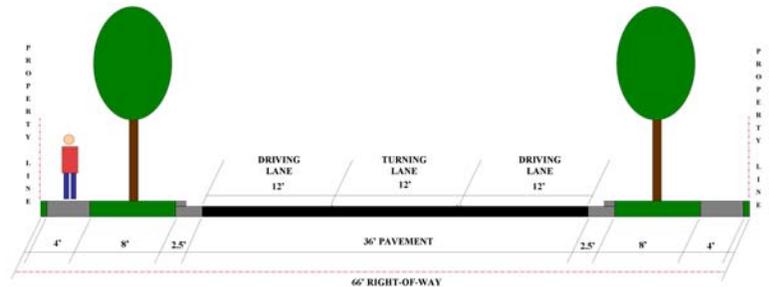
Typical Street Cross Section of where local corridor street intersect Monroe and Washington Boulevards.
